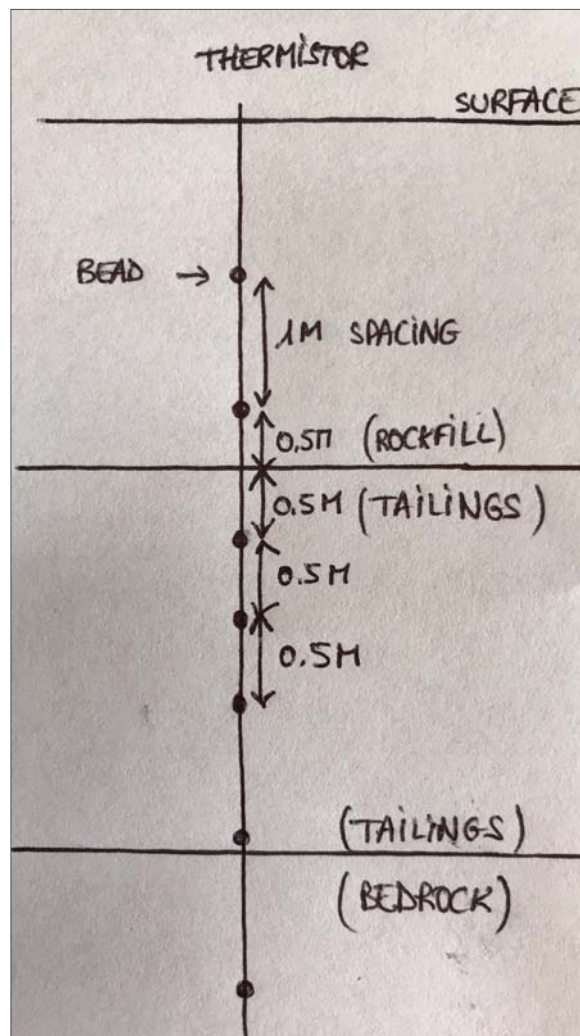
Schematic cross-section of a thermistor showing the required spacing around the rockfill-tailings interface
